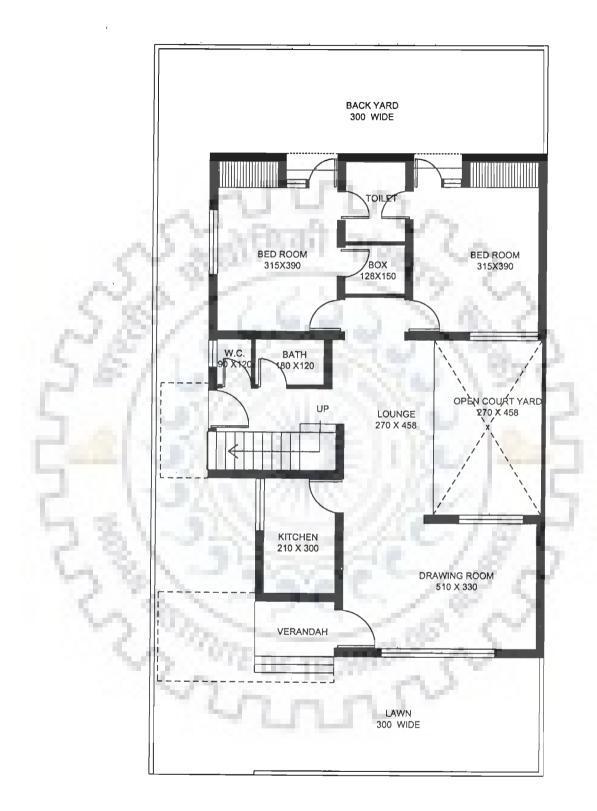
(a) - Ground Floor Plan of Project No. 7 (Plinth Area = 120.49 sqm; Floor Area = 104.48 sqm)
